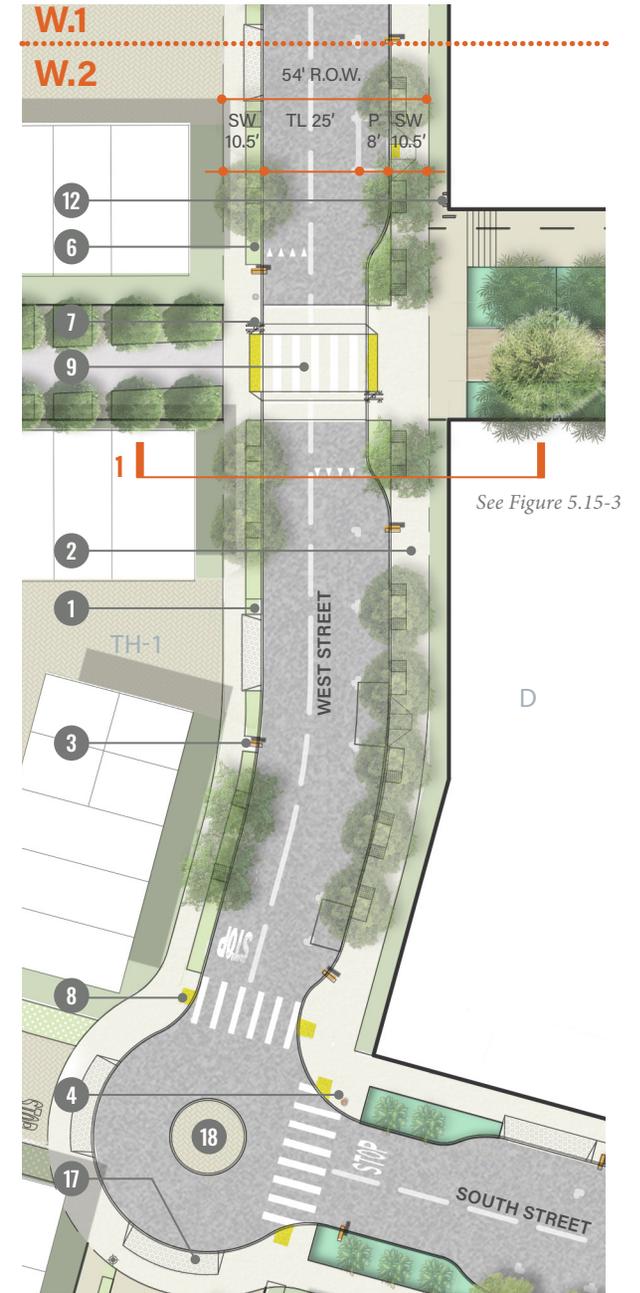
West Street, Site Plan W.1 & W.2
